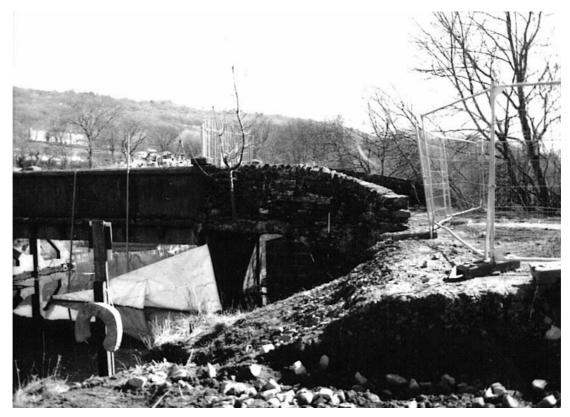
South-western wing wall (11) and sandstone abutment (12) (MF SB06_06)
